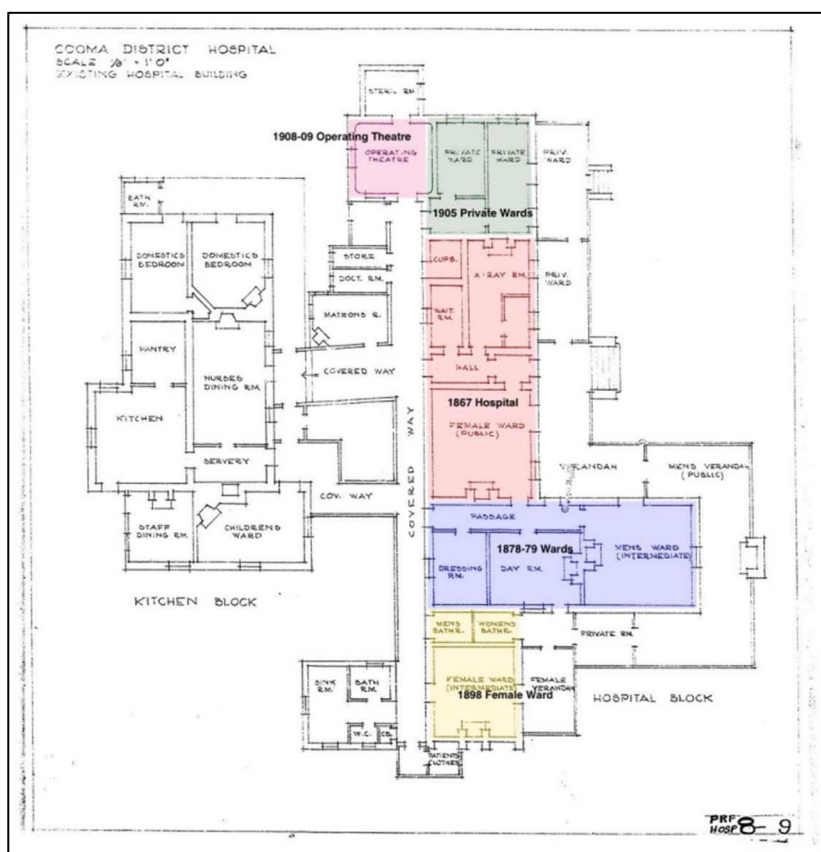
Plan showing the main construction phases associated with the heritage-listed hospital building. (Source: NBR's Heritage Impact Statement dated April 2024)
